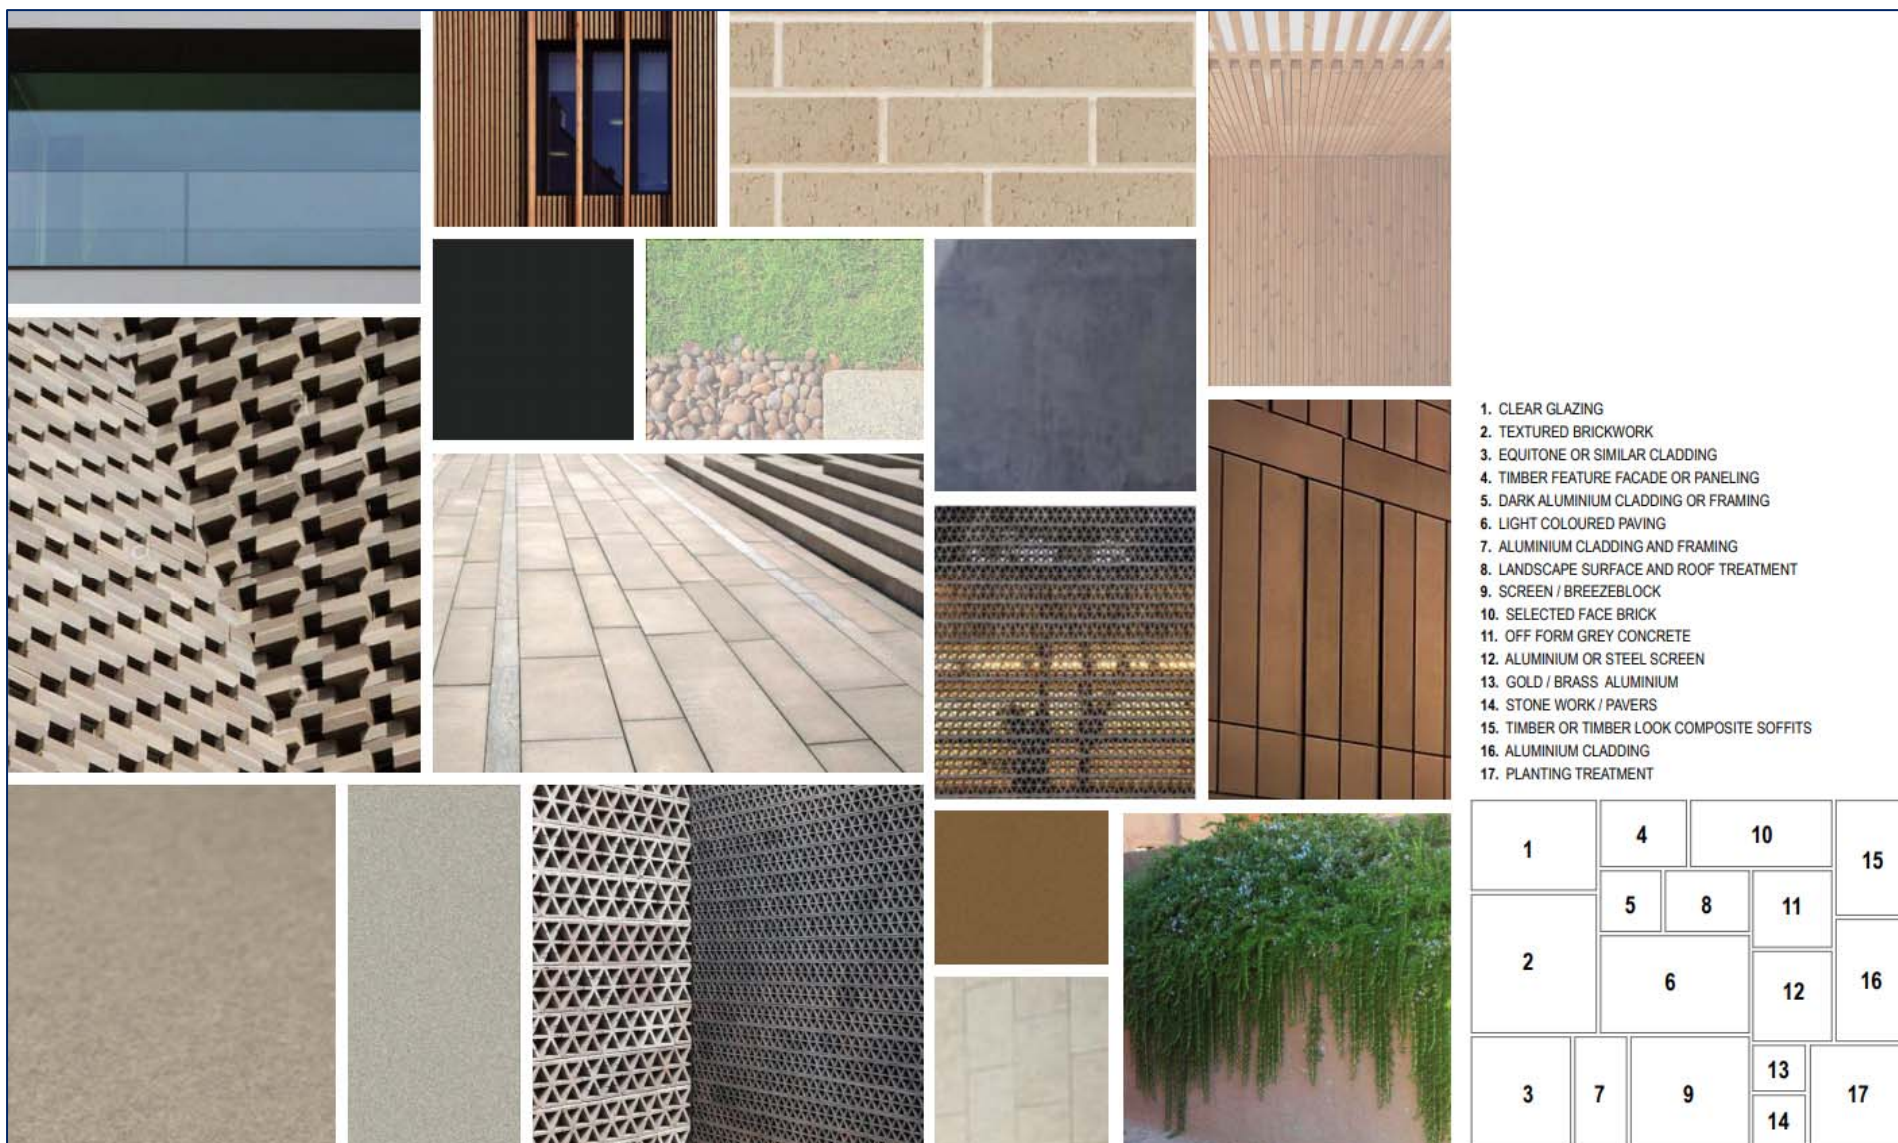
| External finishes – STEAM and ILC building (Source: Applicant's RtS)
